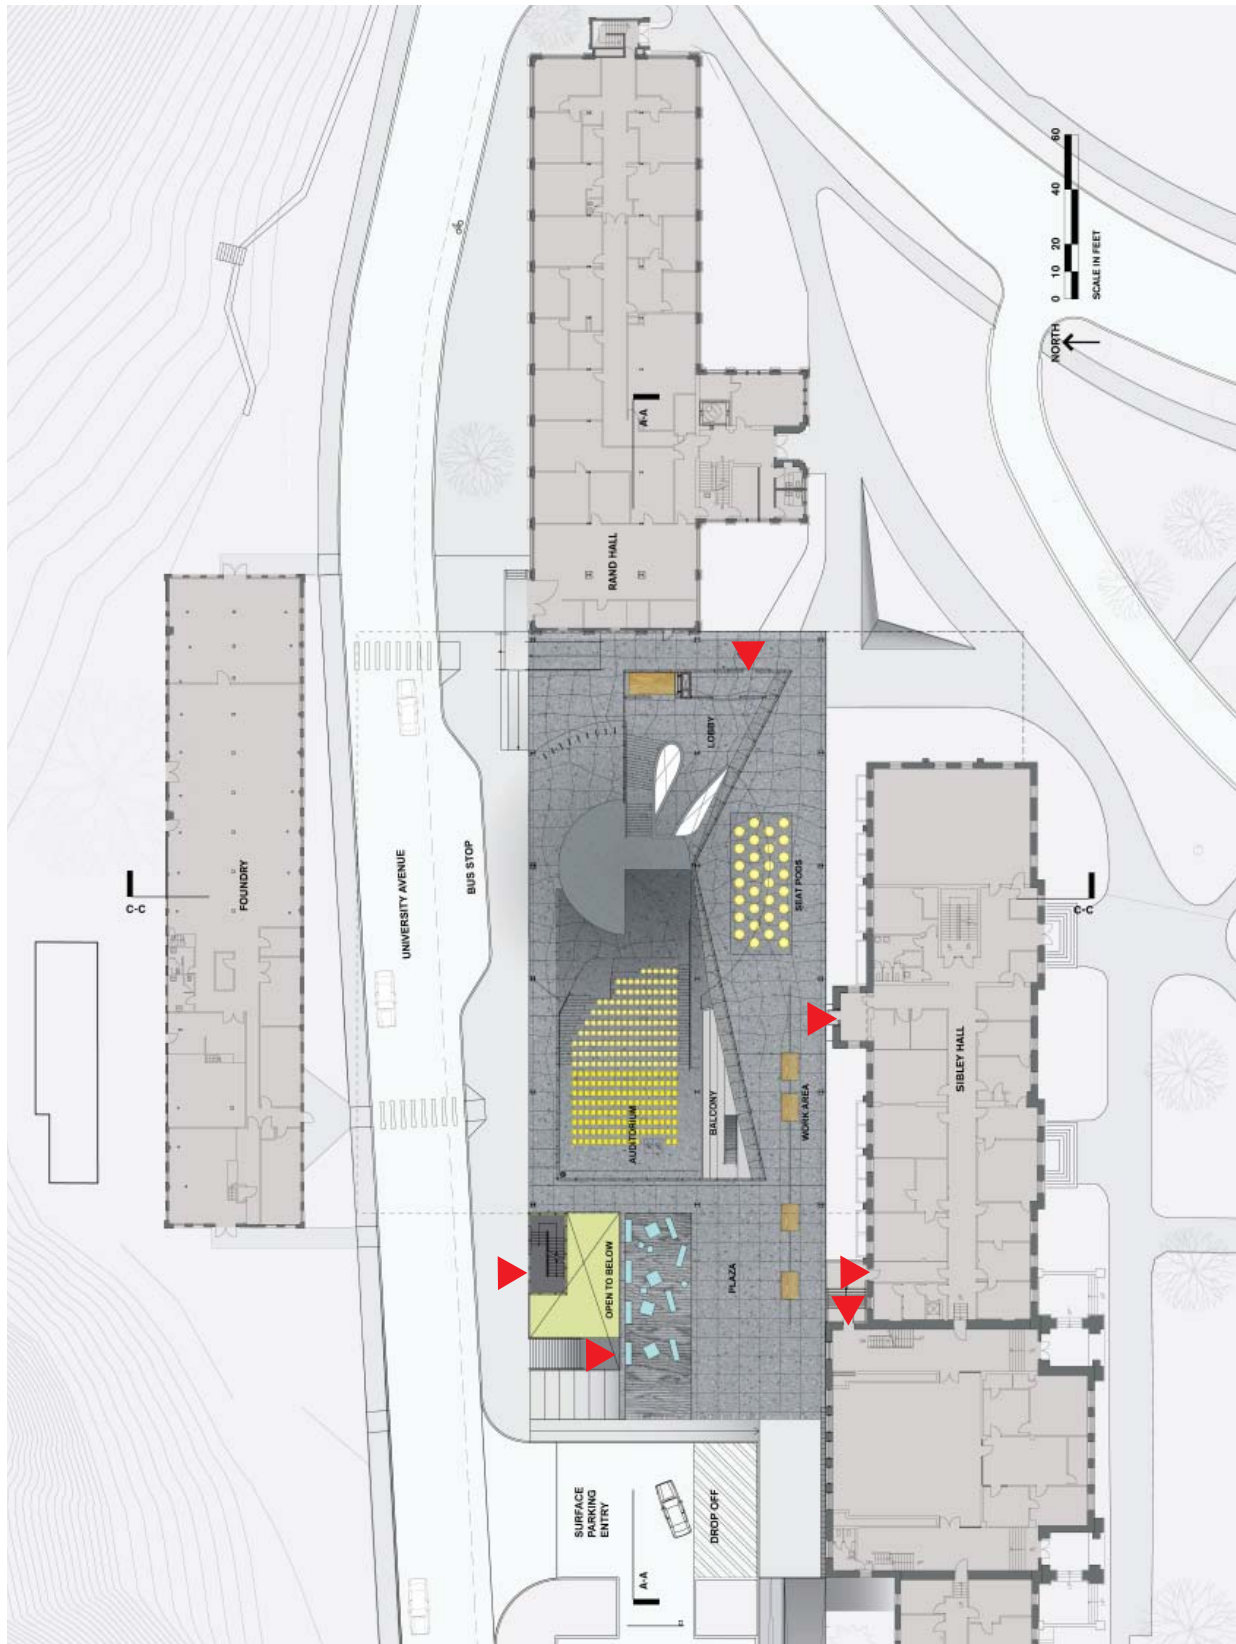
d: Ground Floor Plan: Milstein, Sibley, Rand, and CAPG. Red triangles indicate building entrances.
